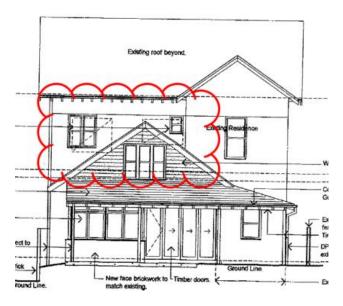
Approved south-eastern elevation of DA/593/2002 showing the removal and replacement of 2x windows at No. 71 Darley Road, Randwick.
